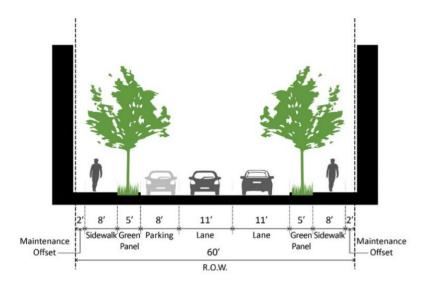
Business Street Section in 2019 Veirs Mill Corridor Master Plan
